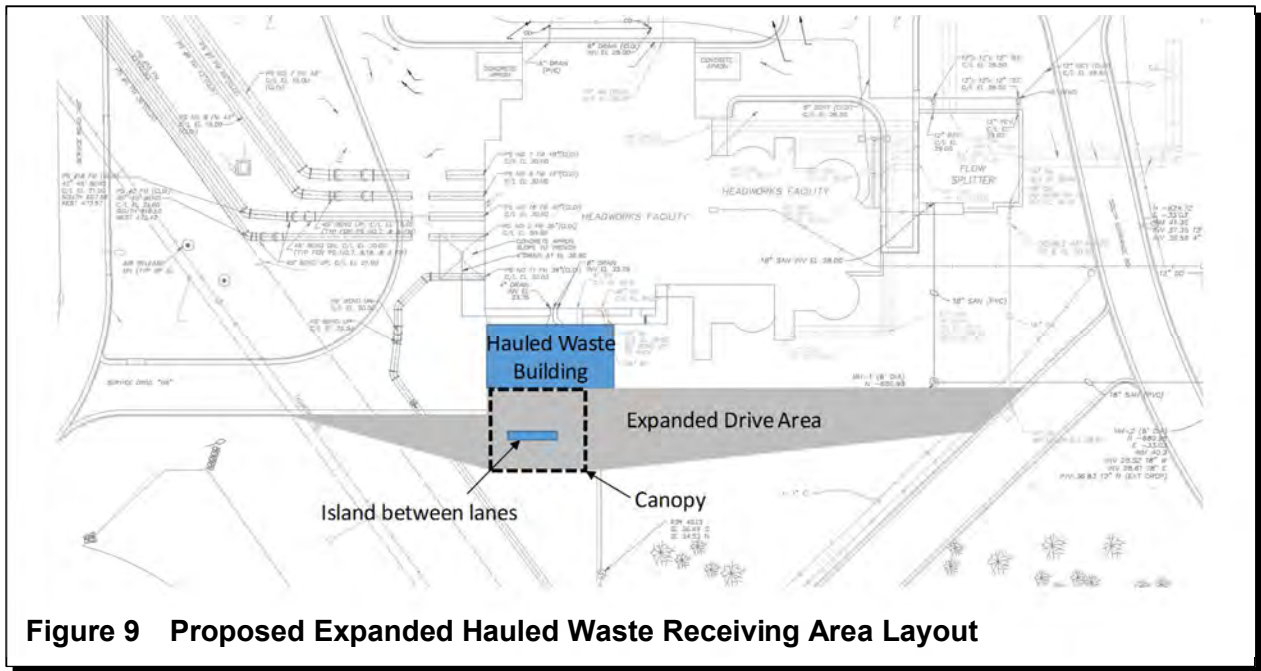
Proposed Expanded Hauled Waste Receiving Area Layout
